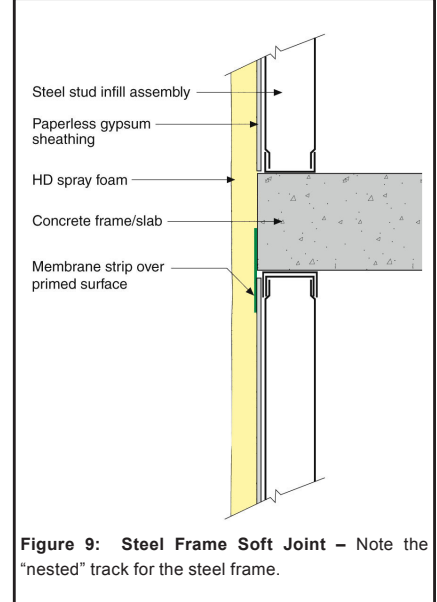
Steel Frame Soft Joint – Note the “nested” track for the steel frame.
